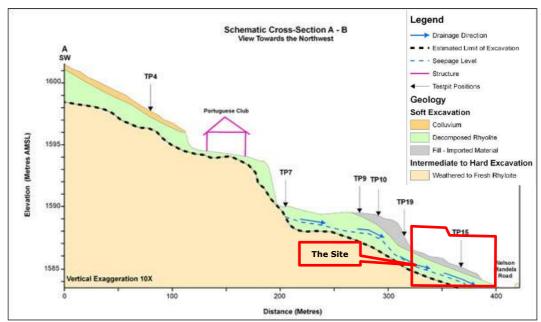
Schematic cross-section of site (taken from Hansmeyer, 2010)
